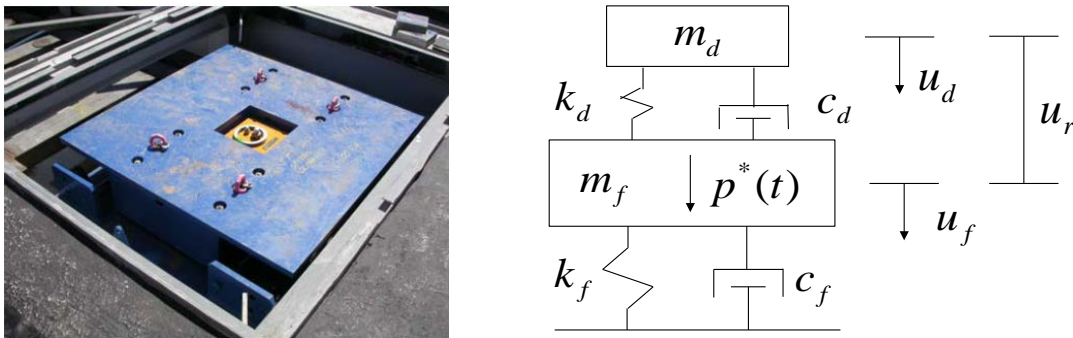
a) TMD installed under the deck of a footbridge [2]. b) TMD-footbridge interaction model.
